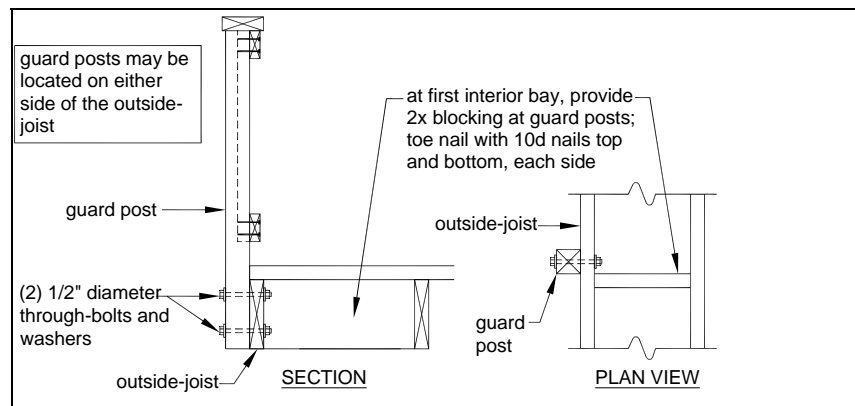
GUARD POST TO OUTSIDE JOIST DETAIL
